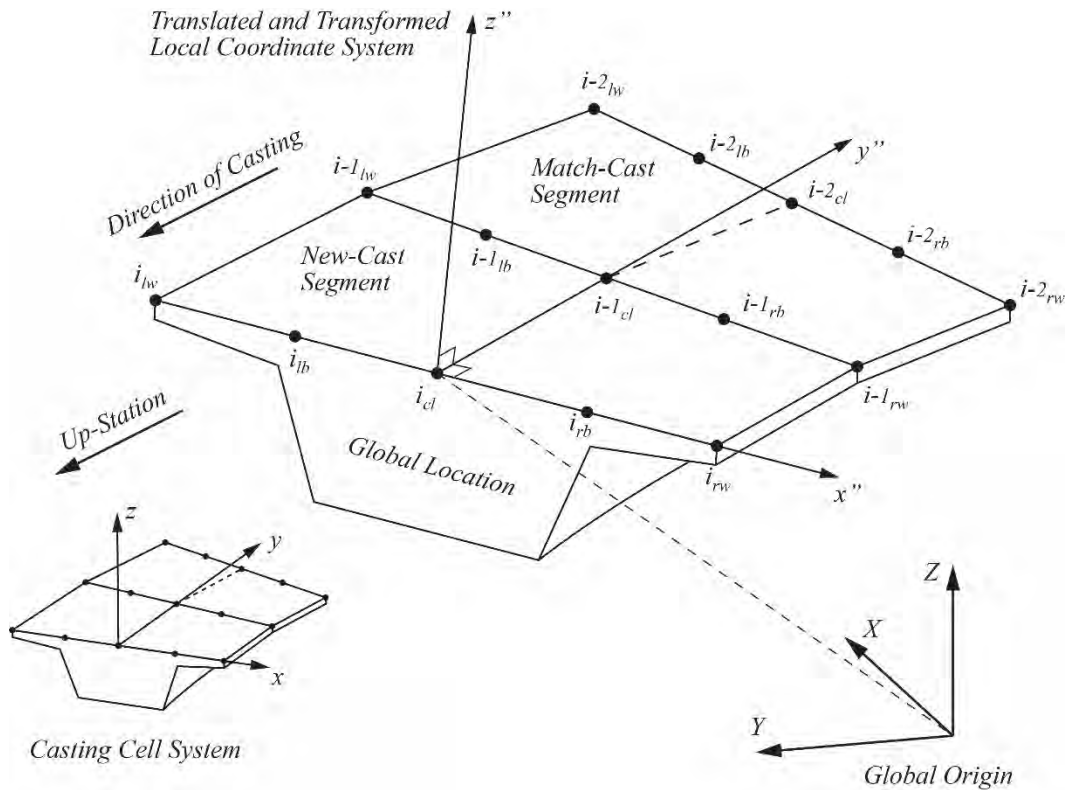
Centerline of Segment Points for a Span-by-Span Bridge
